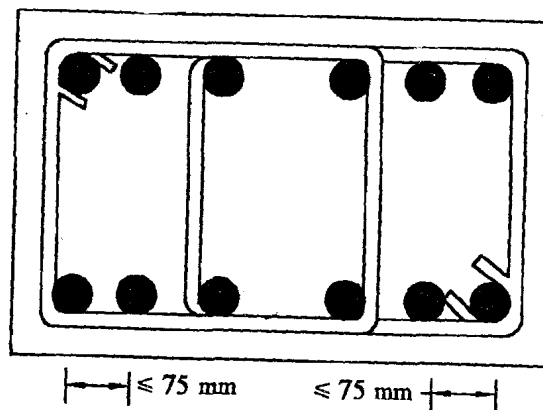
Transverse Reinforcement as per Section 14.4.3a(i)
